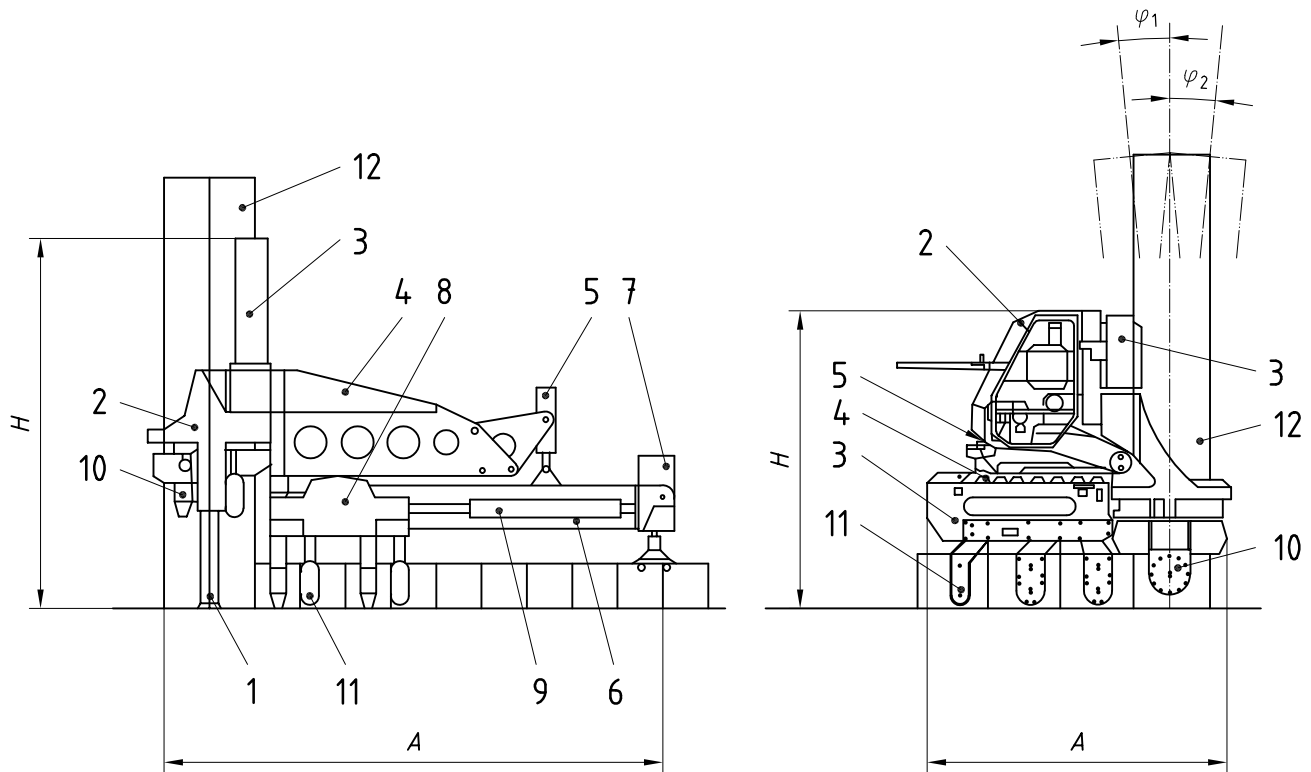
Hydraulic vibrator with the passage holder of the housing pipe, used for execution of reinforced concrete piles cast *in situ
